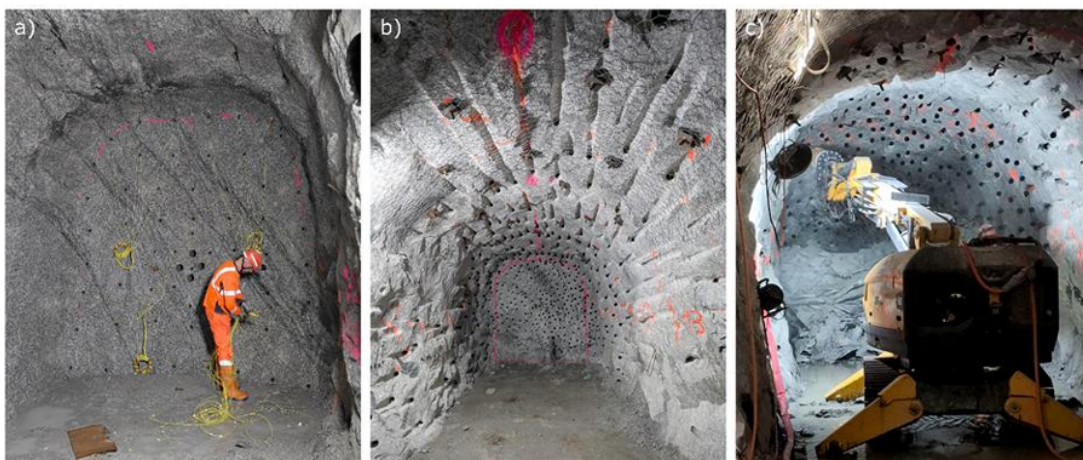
a) Conventional drill-and-blast excavation in the first 10 m of the PRECODE tunnel; b) Mechanical excavation from Tunnel Meter 10–21: drilled short boreholes around and on the tunnel face; c) Mechanical excavation: hydraulic rock splitter is inserted into a borehole and breaks the surrounding rock by hydraulically expanding its wedge-shaped arms.
